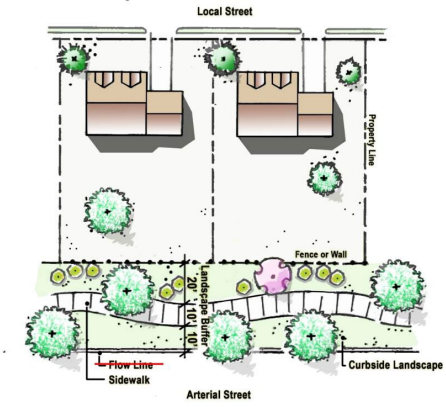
Arterial Street Frontage Buffer Measurement Detached Meandering Walk
